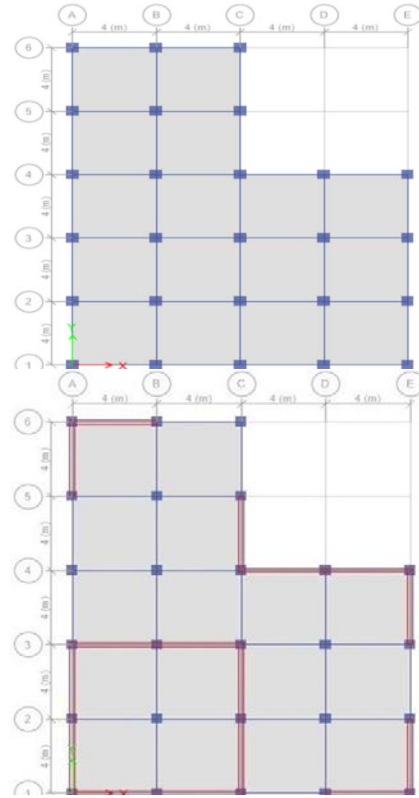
Plan of irregular structure L1 representing bare frame and frame with bracings and infill walls
